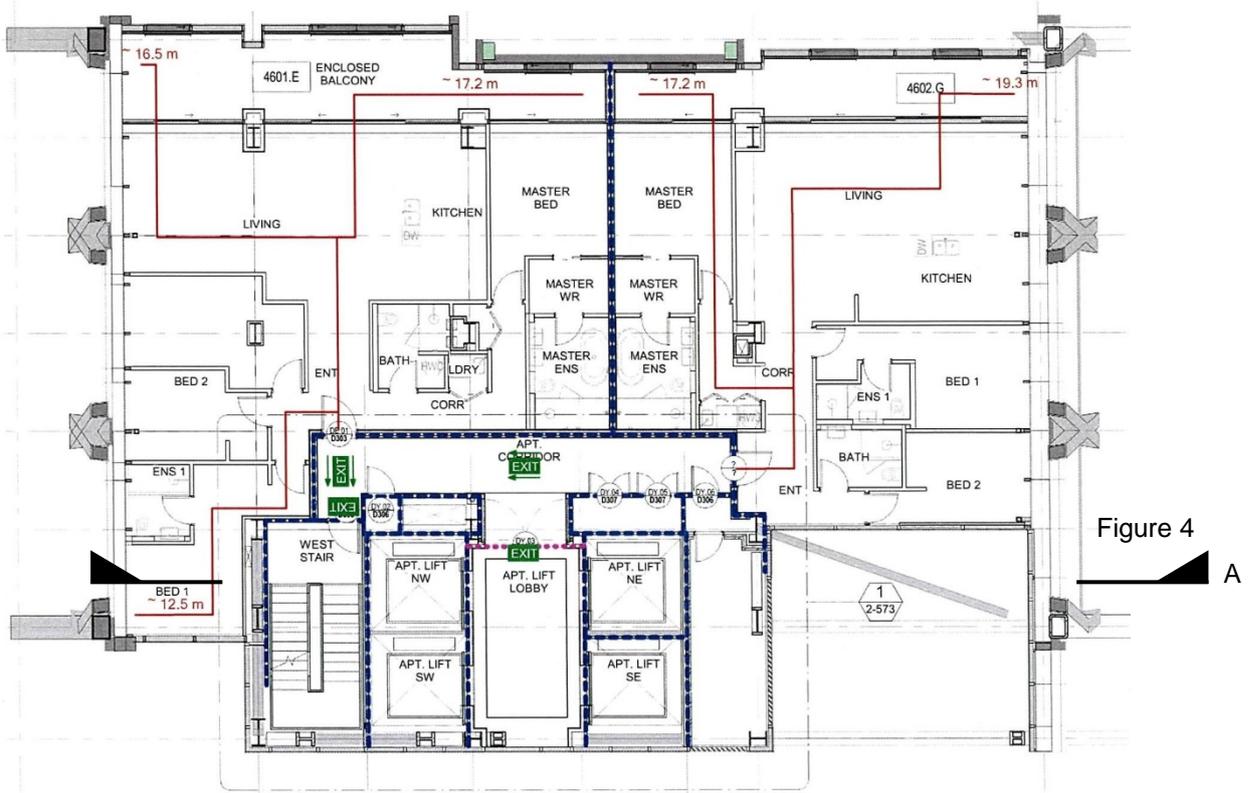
Plan L46 – showing ‘half floor’ apartments with connecting lobby between the lifts and West stair (not to scale)
